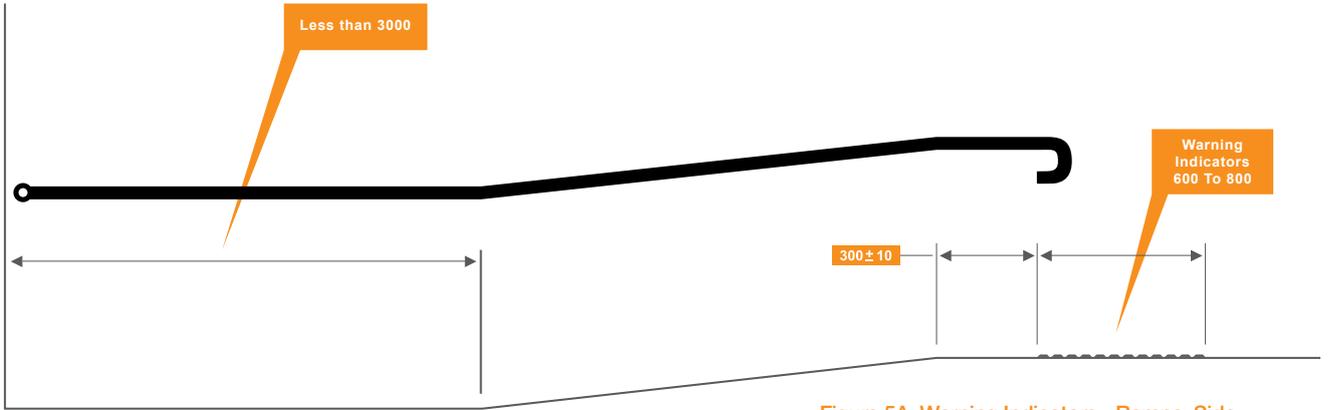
A: Warning Indicators - Ramps. Side elevation where top of ramp leads to an open area and the bottom landing is enclosed, less than 3000 wide and handrail is continuous
